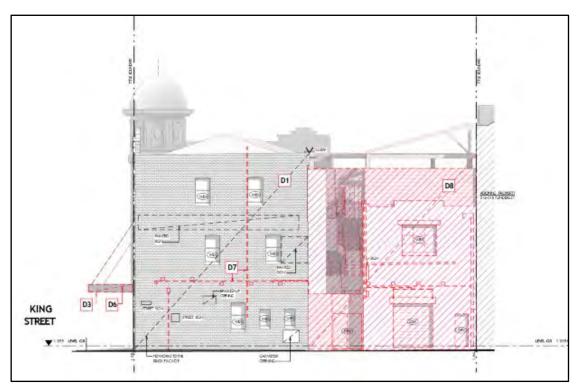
Demolition Elevation (Technē Architecture + Interior Design)
